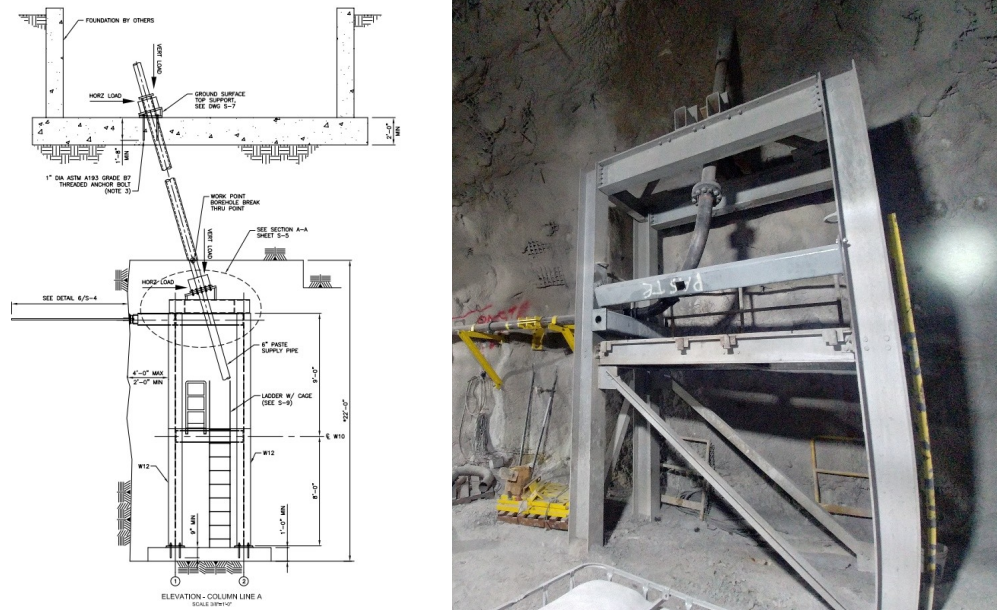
Example of top and bottom borehole supports and the constructed bottom support for a suspended borehole pipe.
